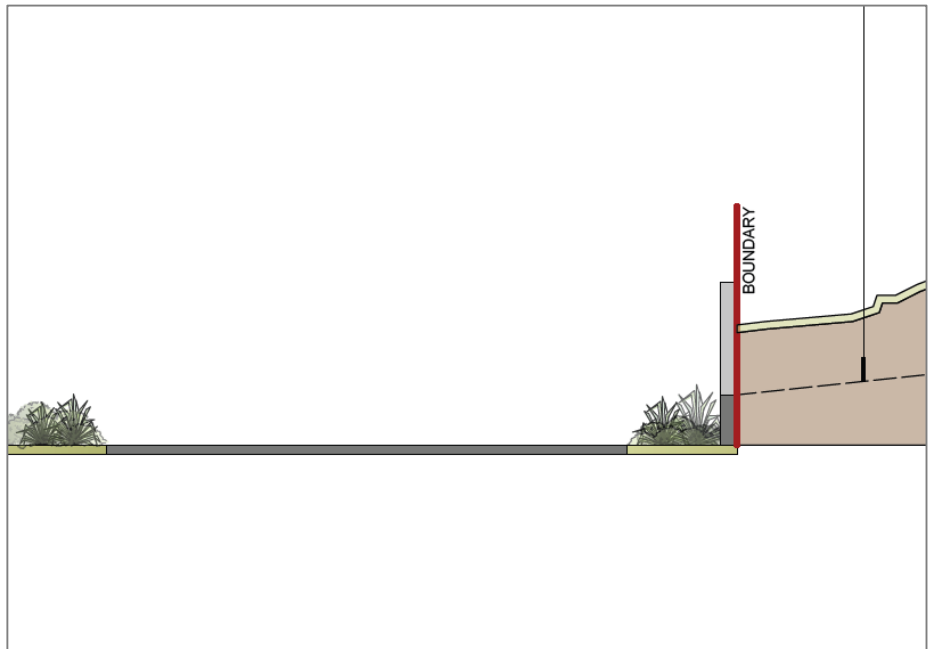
proposed retaining wall between the Site and Aotere Pā with two way stub road access.
